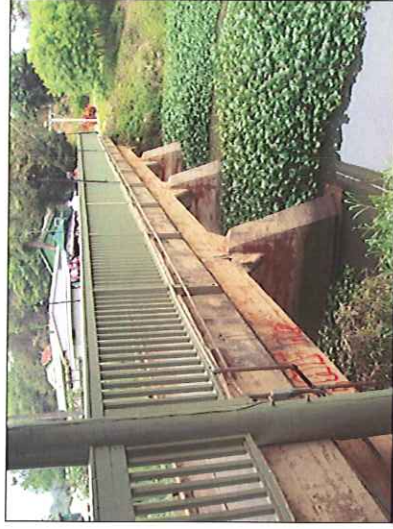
Old railroad bridge spanning Nawilwili Stream, facing north
